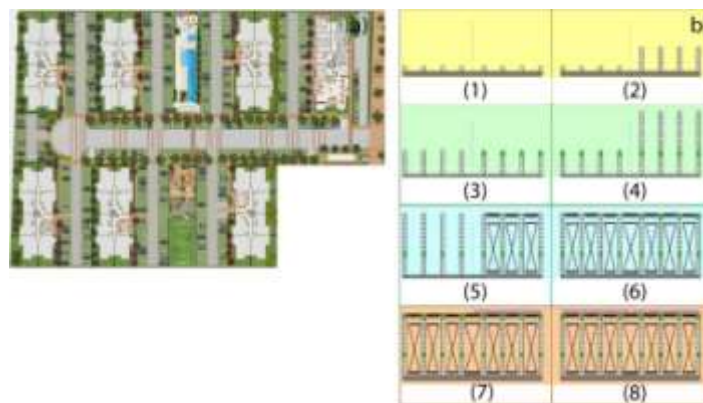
a) Plant of the construction site where structural masonry technique was applied and investigated in the case study, b) step-by-step execution cycle of structural masonry.
